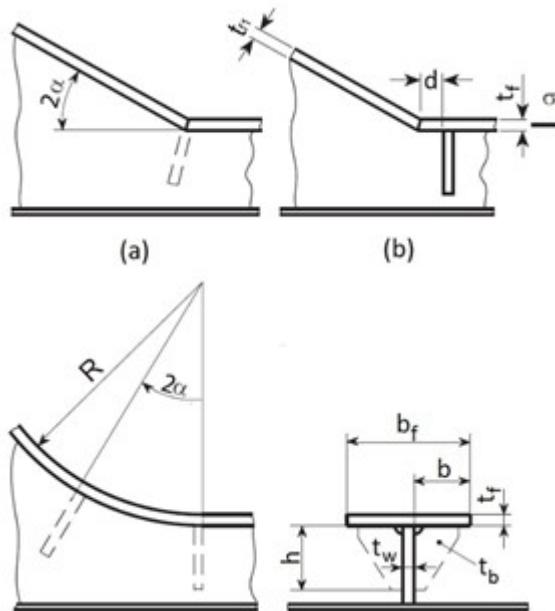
Typical stiffeners of rounded or knuckled face plates
